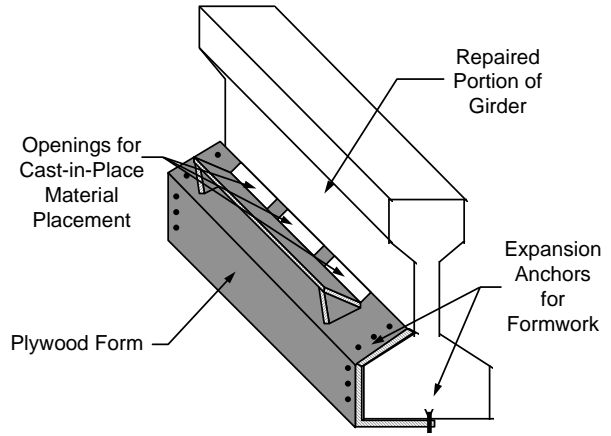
66 Schematic of formwork for cast-in-place repair of Steck girder — final phase
